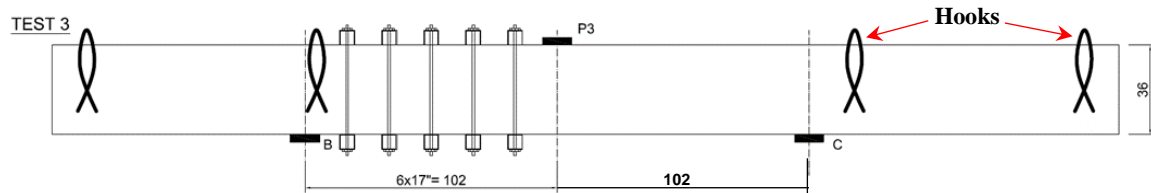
Girder 2-Test 3 configuration (dimensions in inches)
